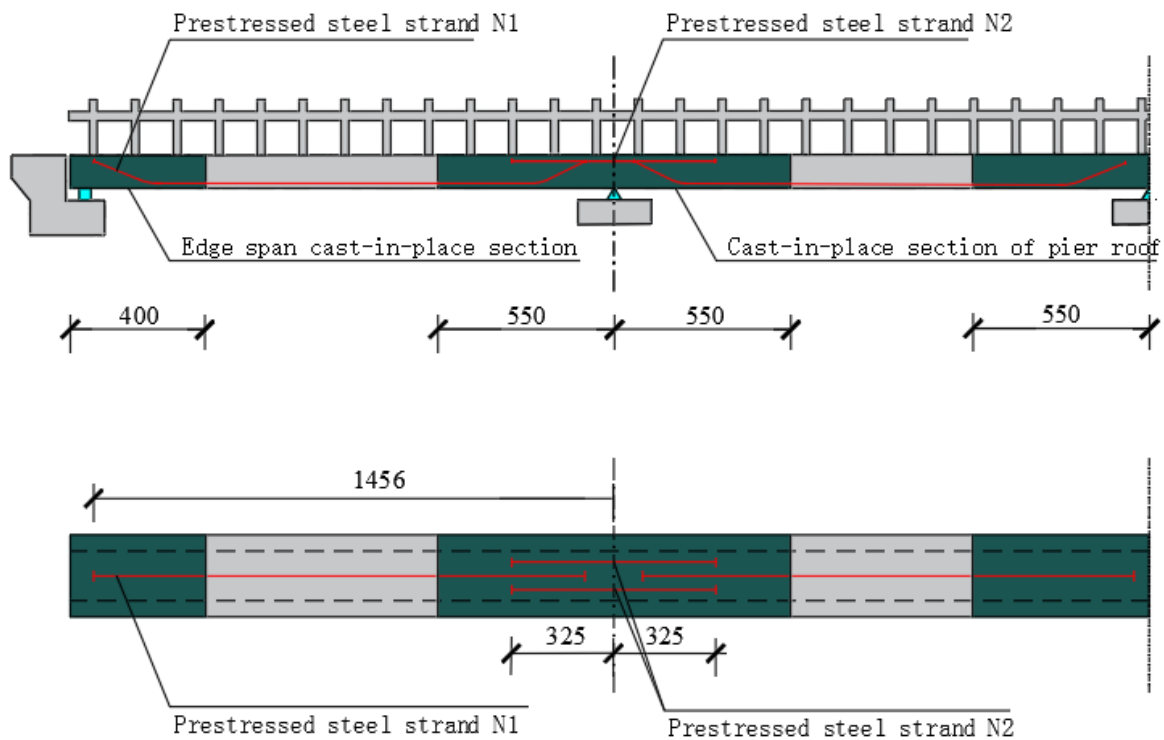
Prestressed steel strand layout diagram (unit: cm)
